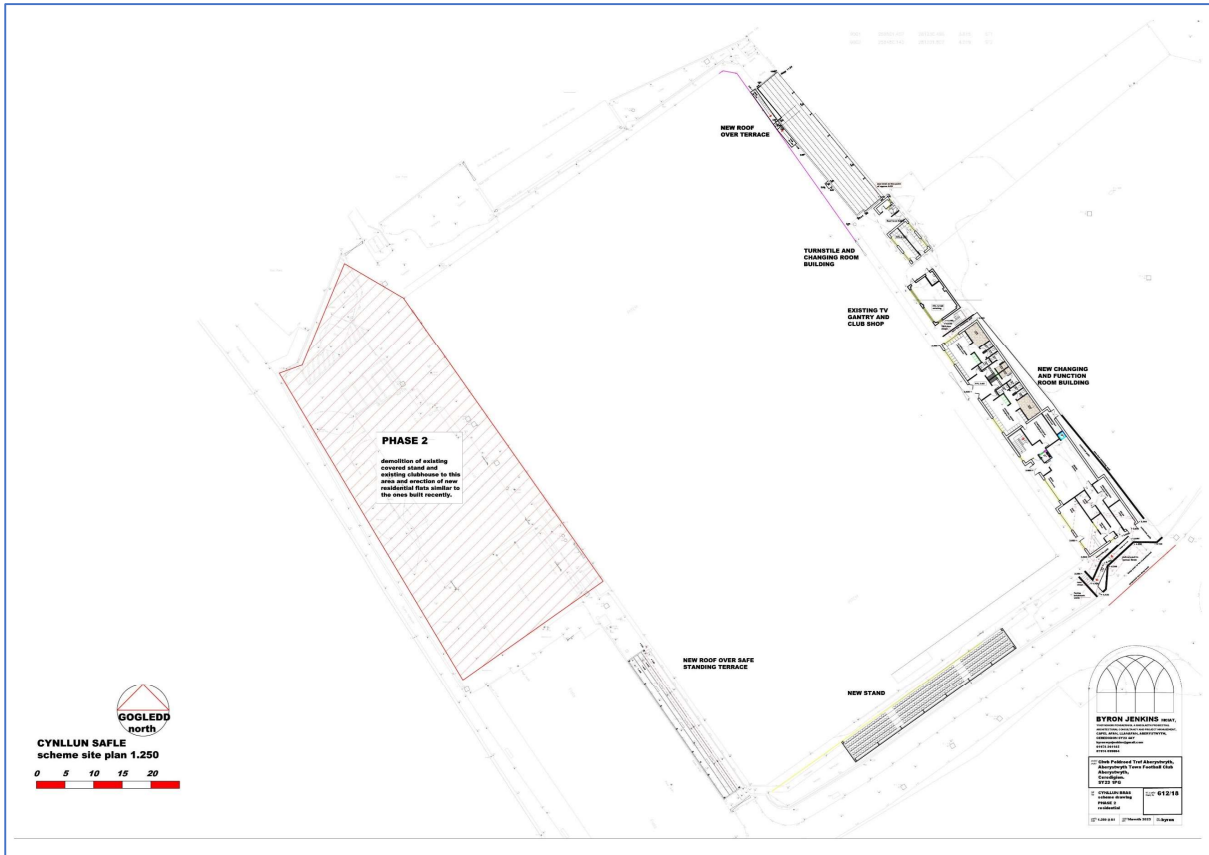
Demolition of Existing Clubhouse and Construction of Proposed New Residential Flats.
